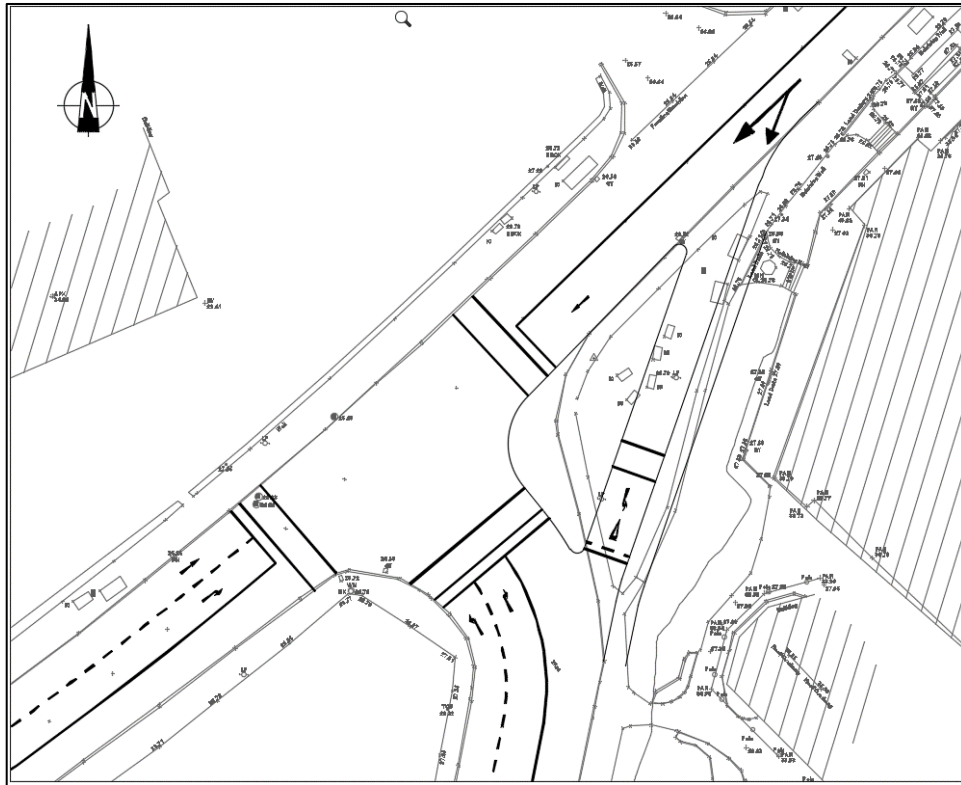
Alternative Signalised Junction Layout at Tuam Road and Joyce's Road
